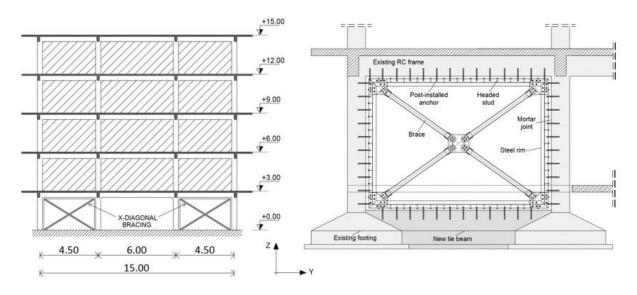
Elevation of the 5-story buildings and typical detail of X-bracing for strengthening the ground story[17]
